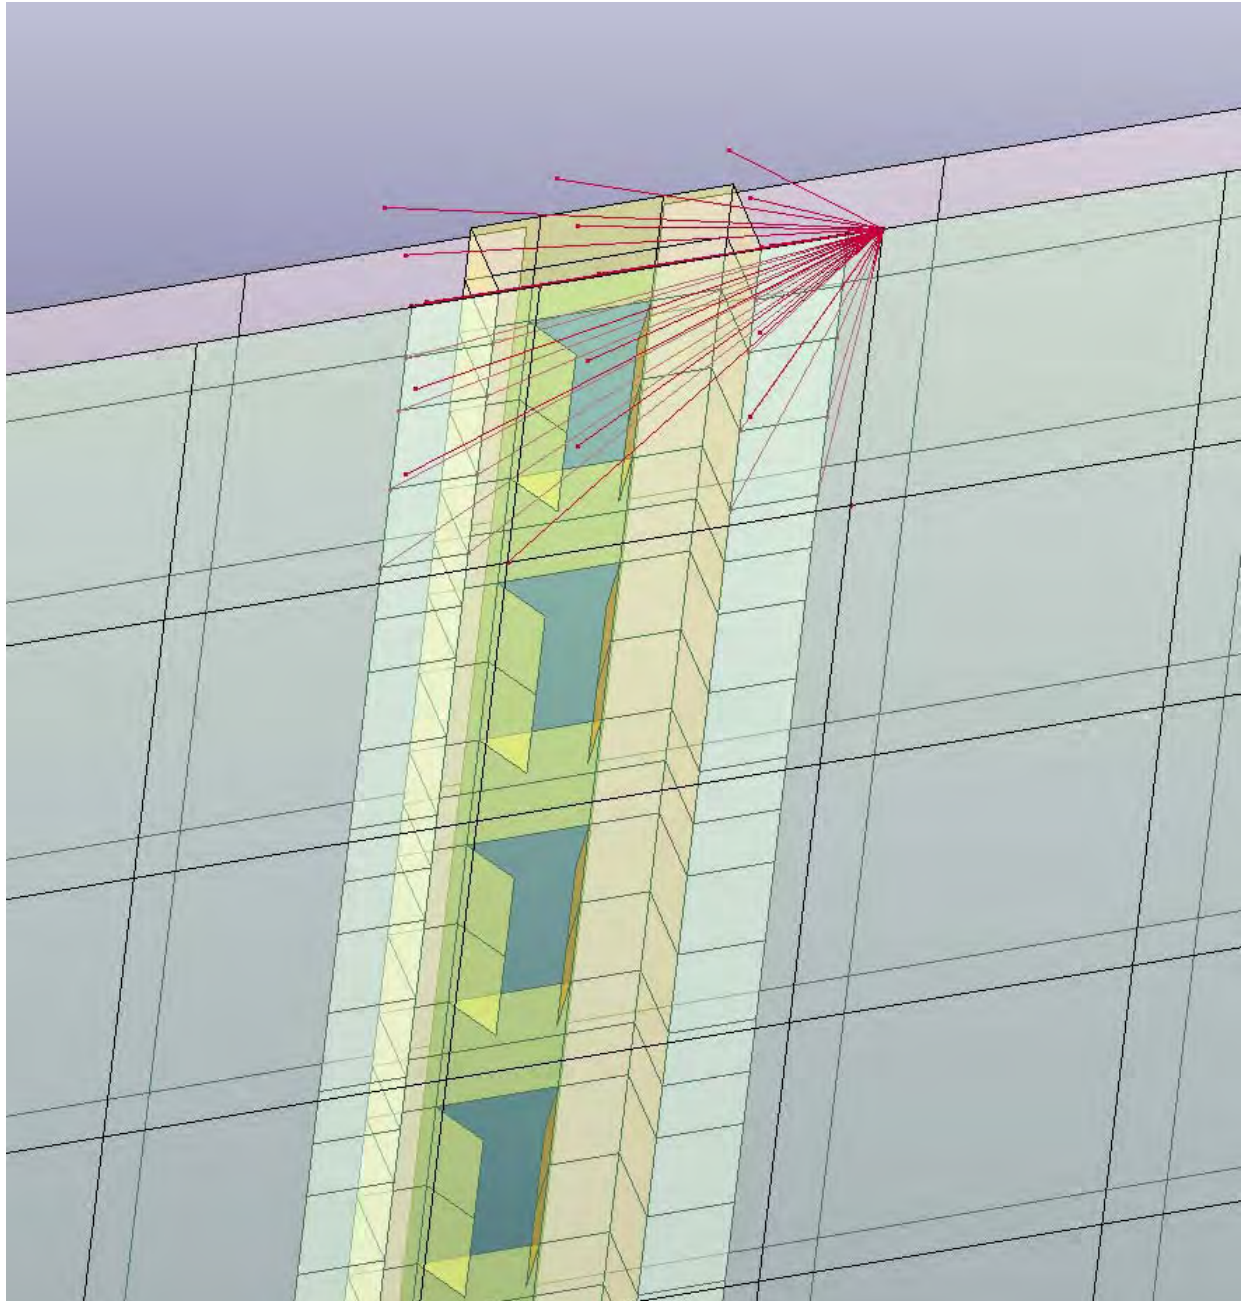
Illustration. Side-wall section detail with plywood removed to show vertical steel hat-sections.
